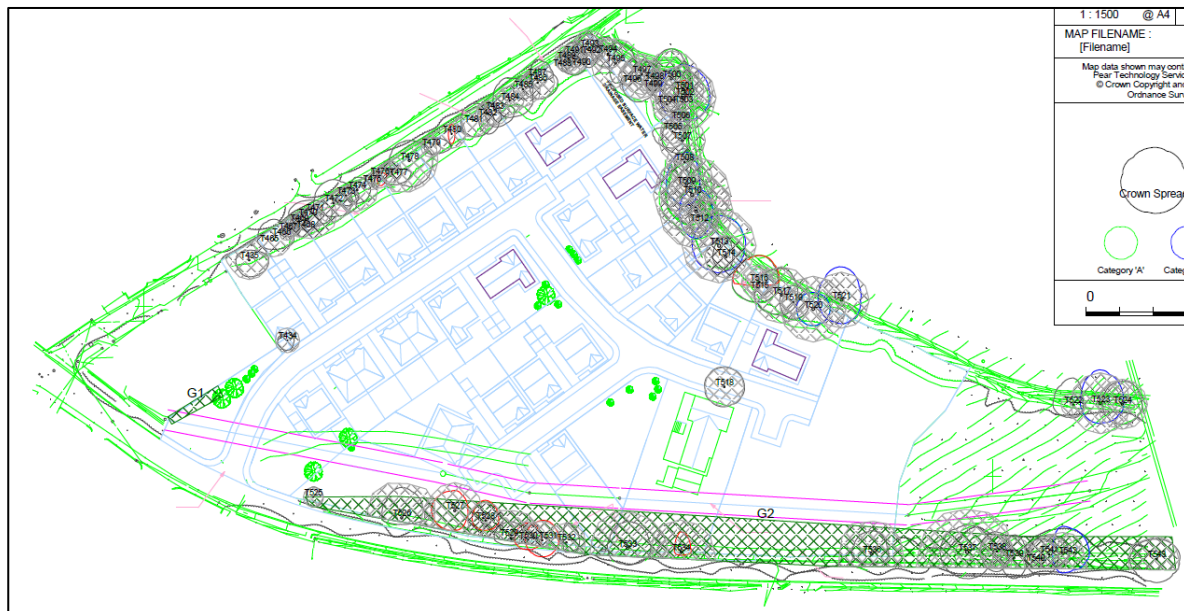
Plan extract showing location of trees at the site in relation to proposed layout, with Category U specimens removed
